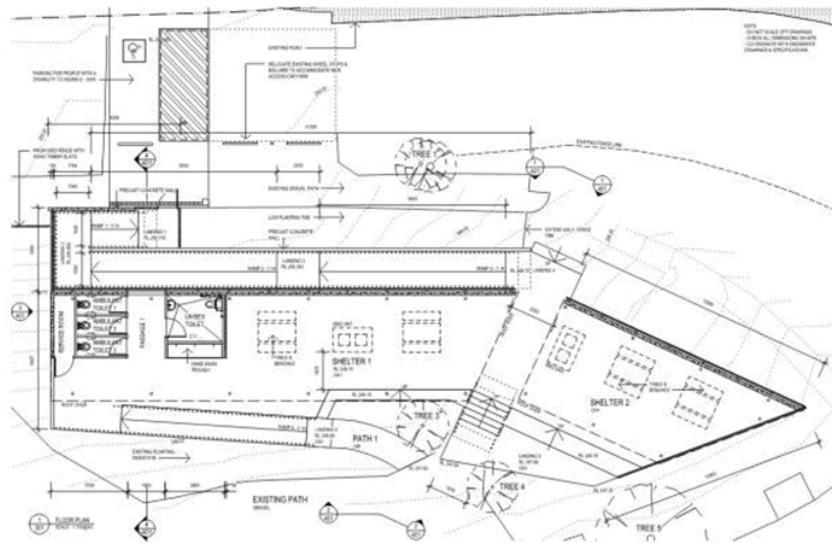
Floor plan of the proposed development at 8 old Proctors Road.
